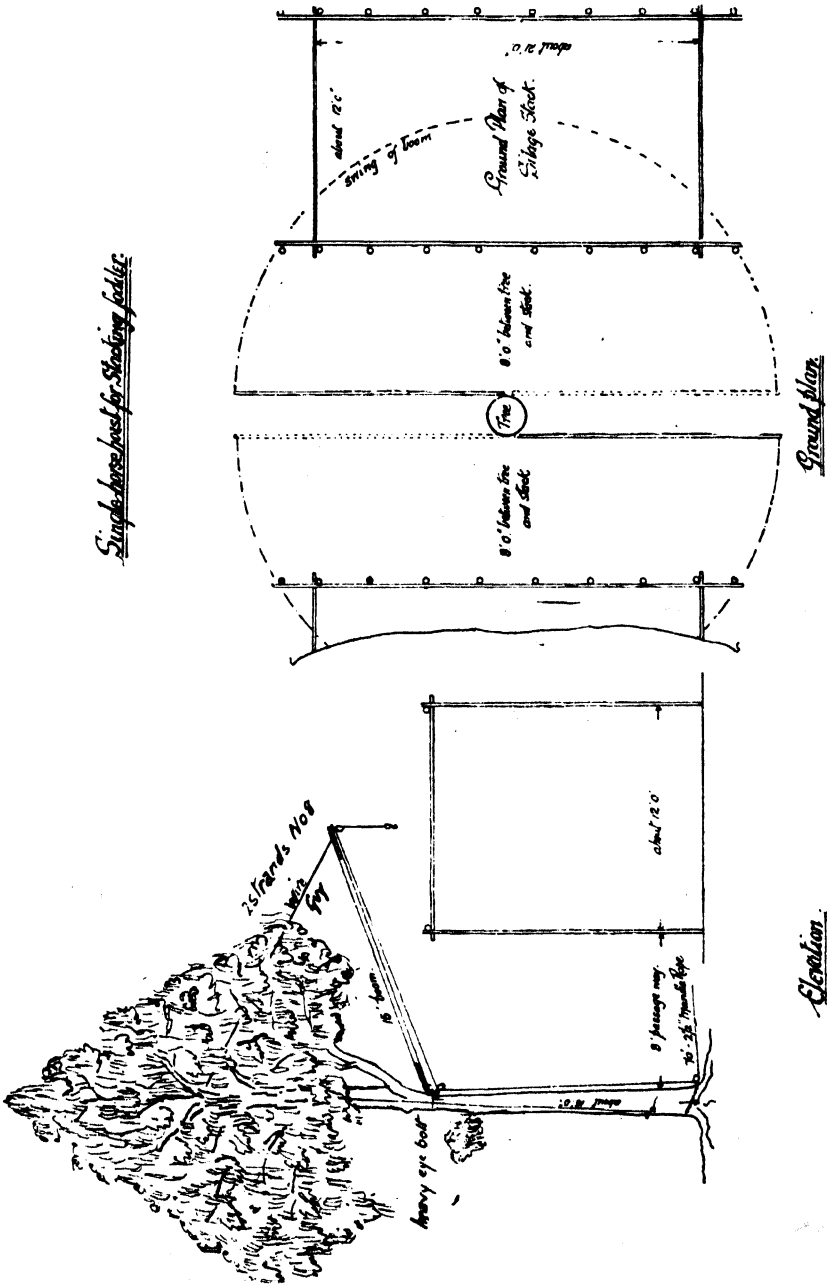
SILO STACK CONSTRUCTION AND GROUND PLAN.
